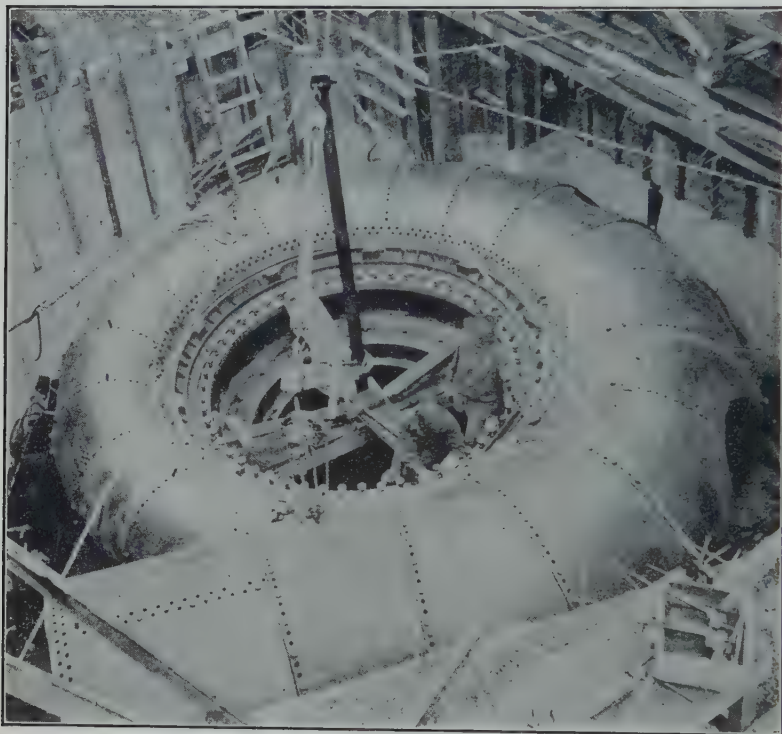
Assembling steel-plate spiral casing in the field—90-in. inlet diameter—Kern River Plant, San Joaquin Light and Power Corporation, Calif. (Courtesy of Allis-Chalmers Manufacturing Company.)
